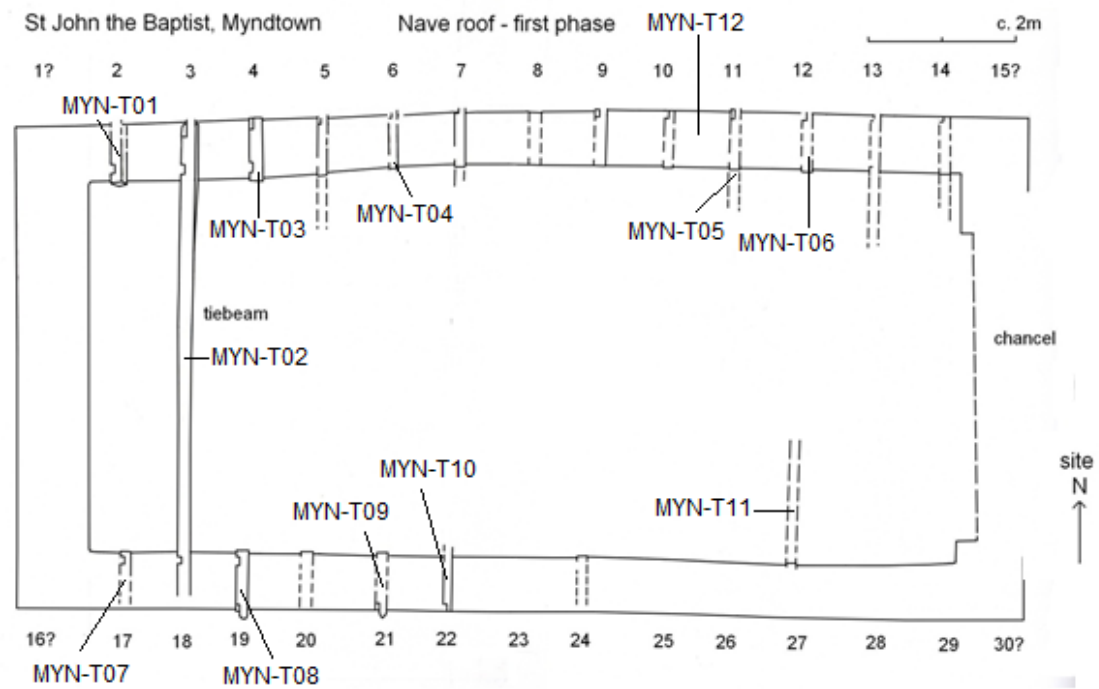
Plan of the nave roof, showing the location of samples MYN-T01–12 (Bob Meeson)
